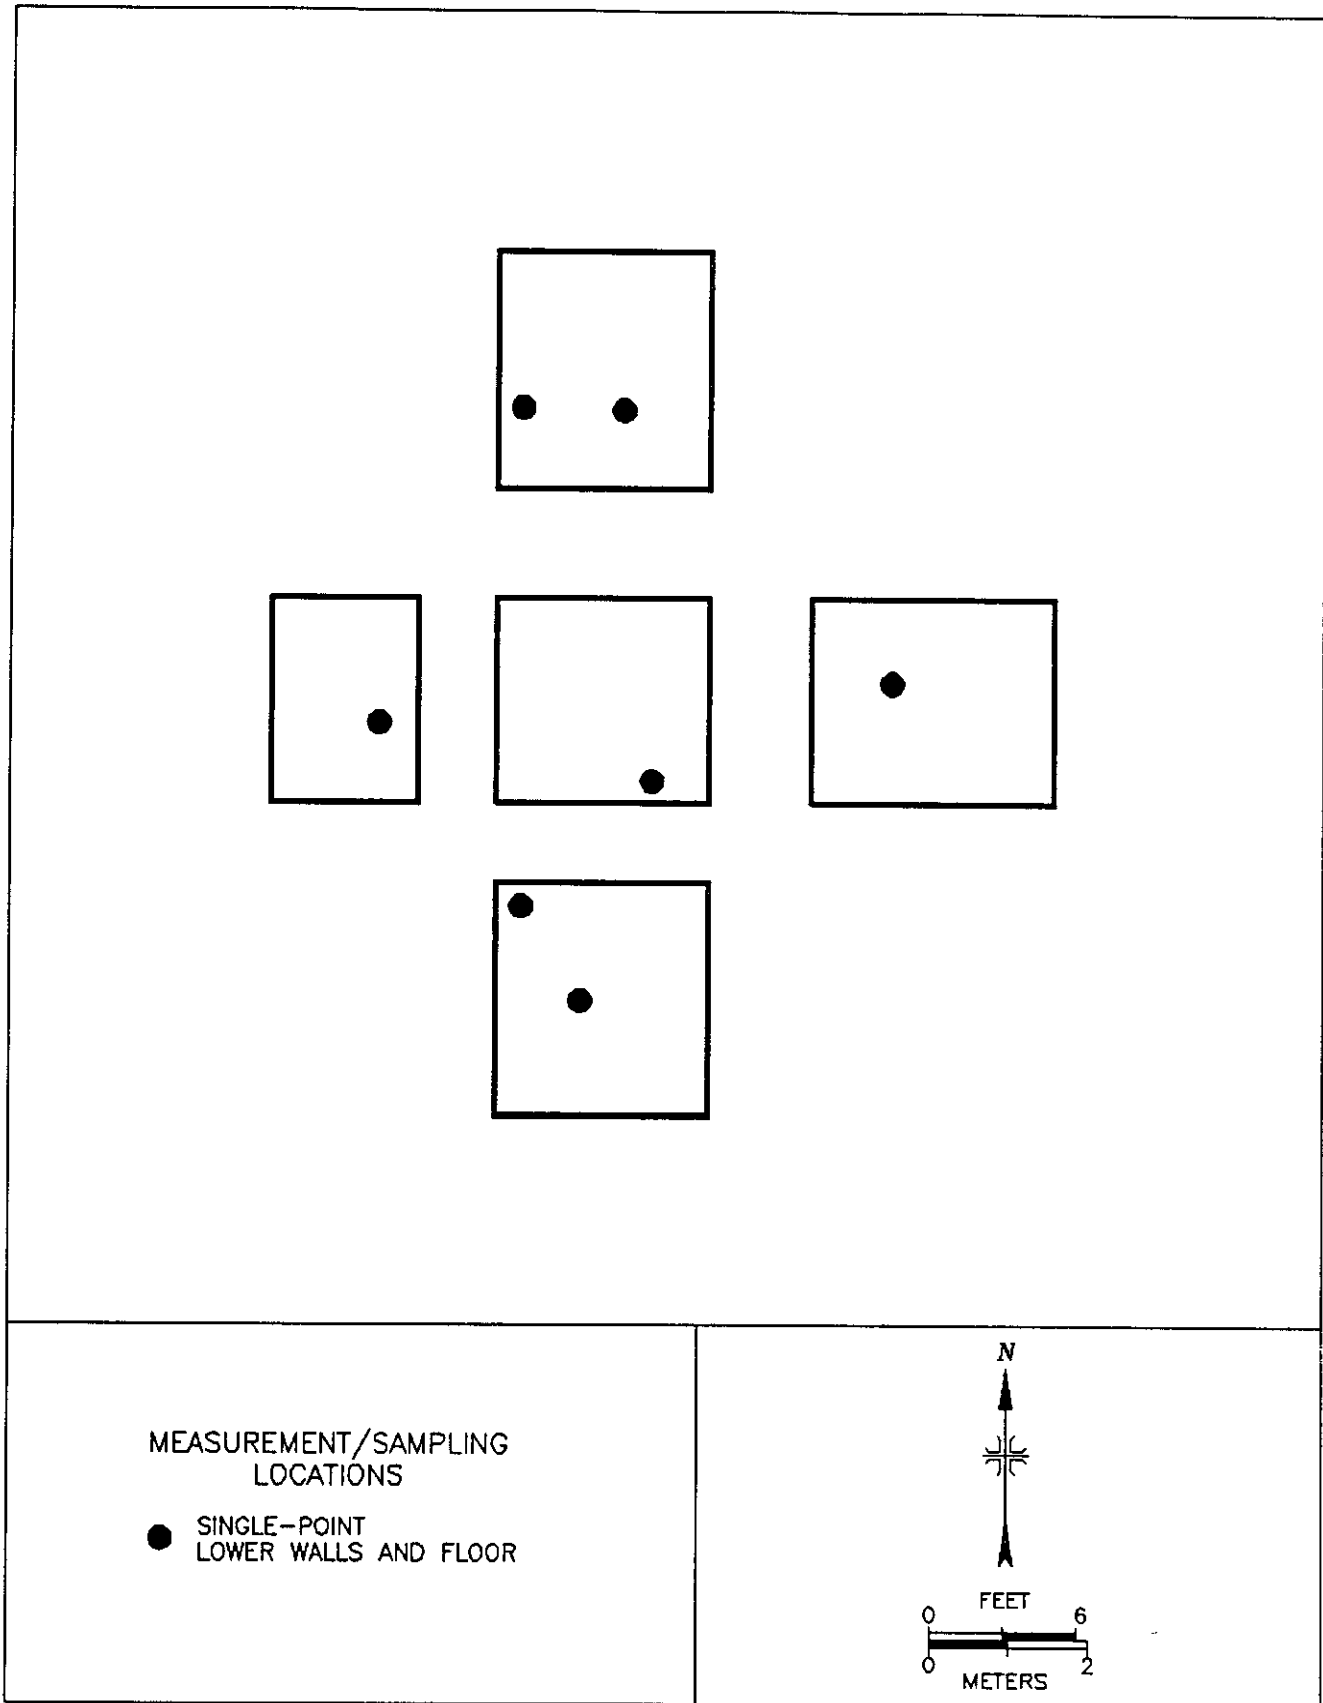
Elevator Pit, West Bay – Measurement and Sampling Locations
